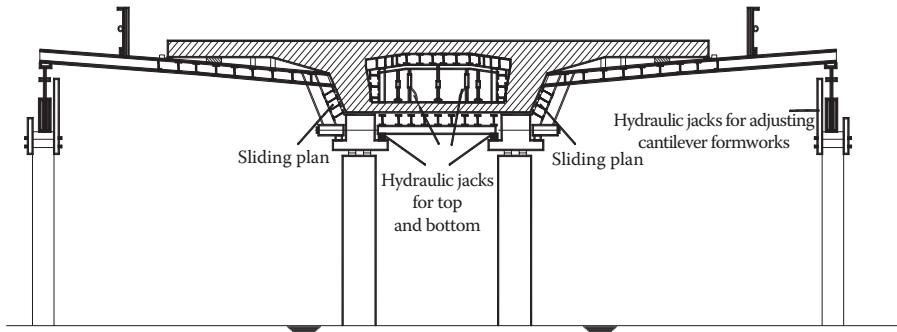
Transverse section in fabrication area before lowering formwork.
